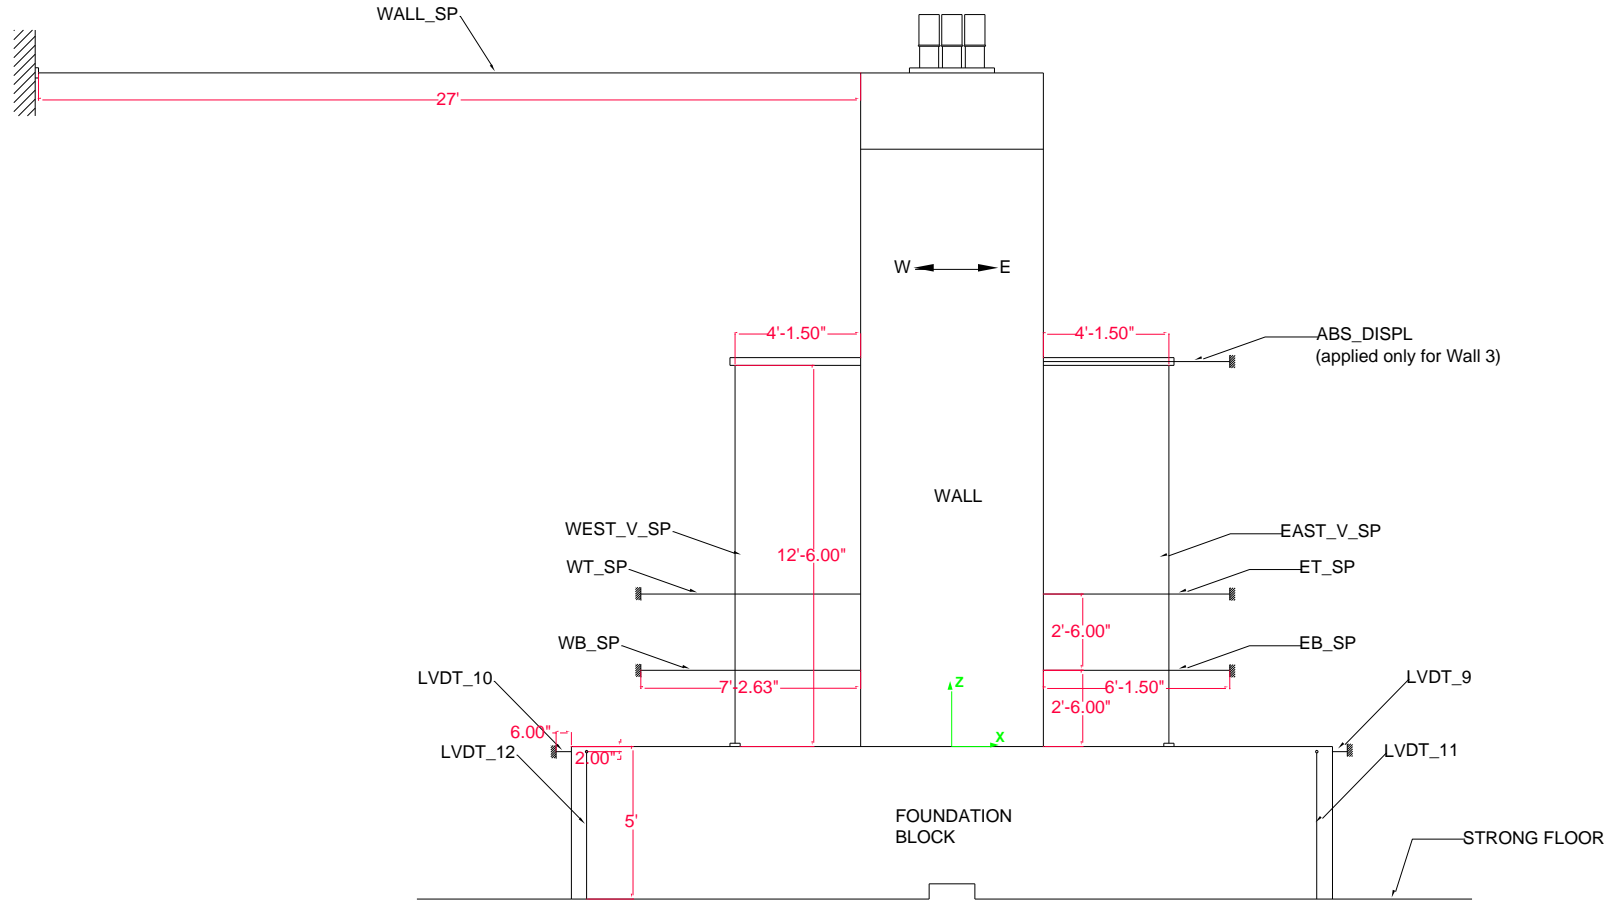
Vertical and horizontal displacements transducers on Wall 2 and Wall 3
